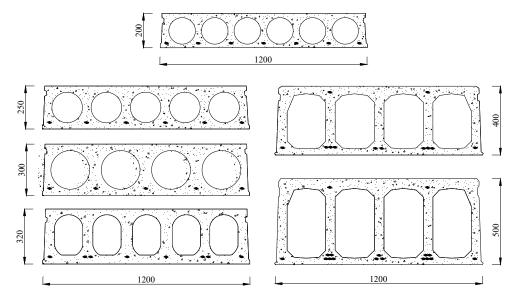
Typical HCS cross sections (all dimensions are in mm).
